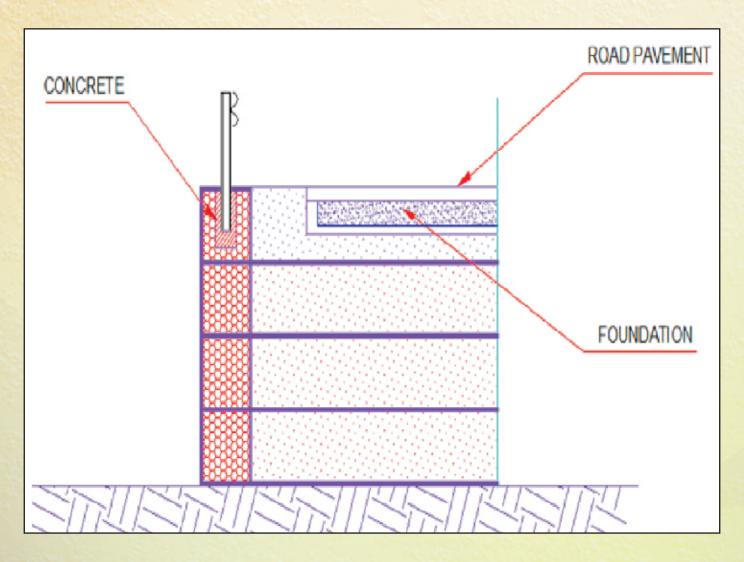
Typical Scheme of Reinfored soil wall with Gabion facia
